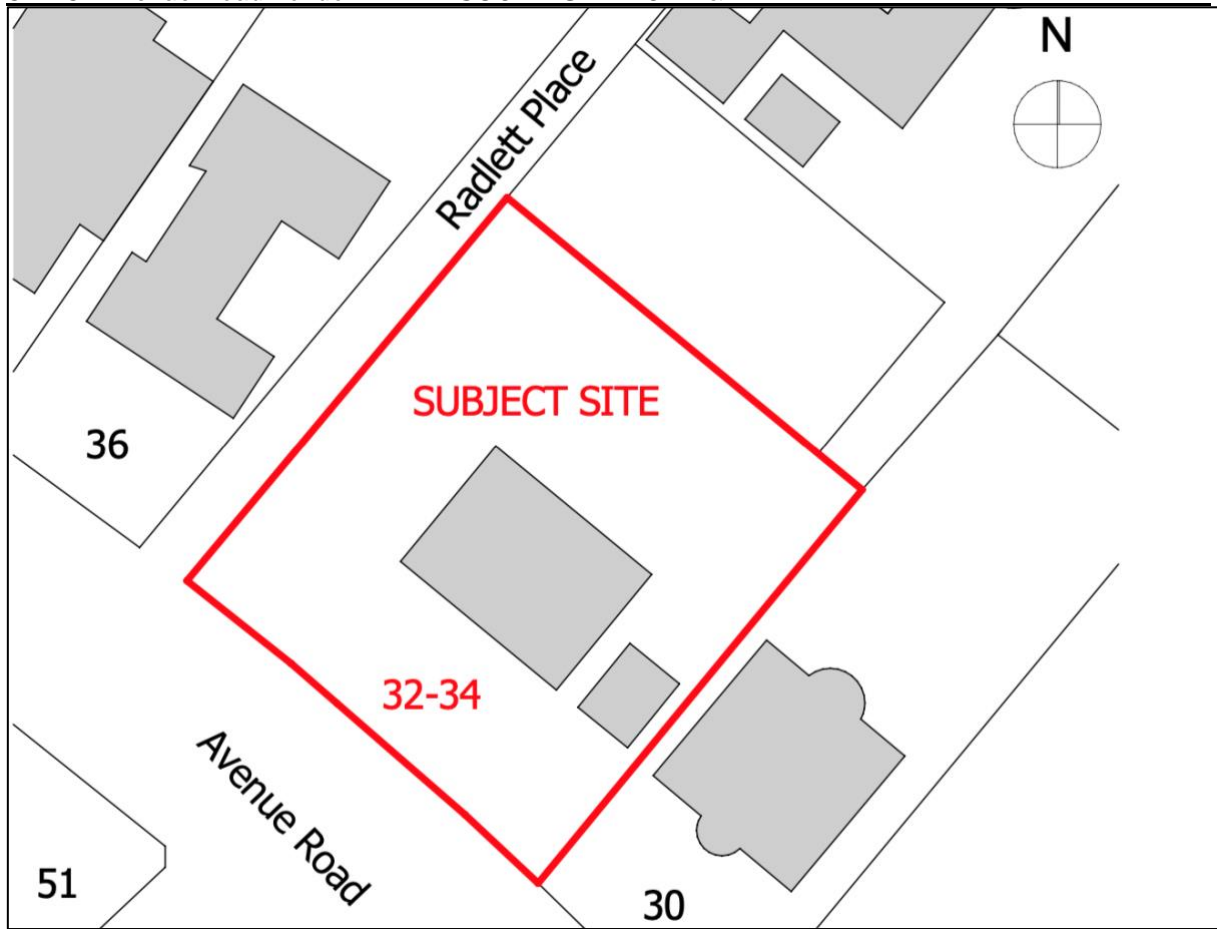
Top – an existing block plan of 32 – 34 Avenue Road London, reproduced courtesy of SHH Architecture
